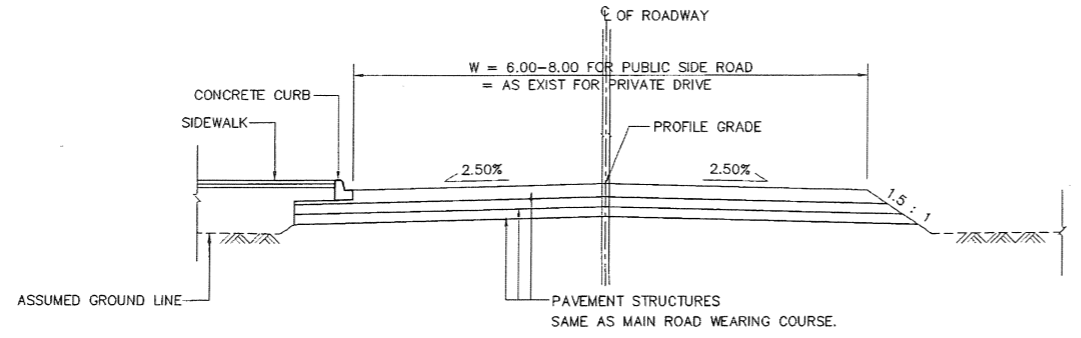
TYPICAL PRIVATE DRIVE AT SIDEWALK (PROFILE)
